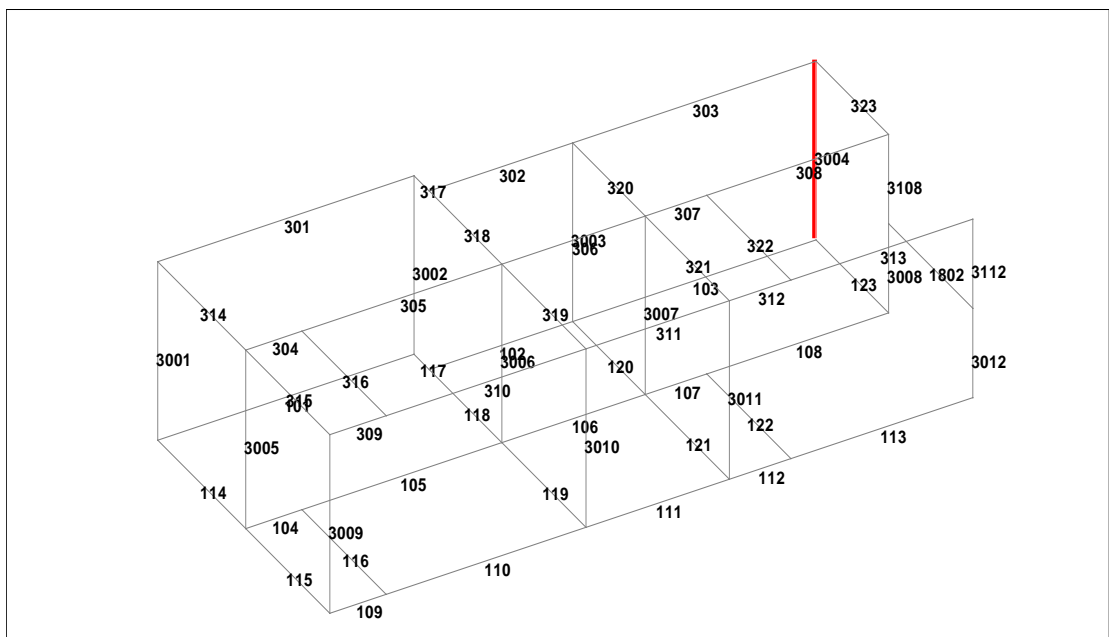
Second floor column no 3004 (shortage of reinforcement)
